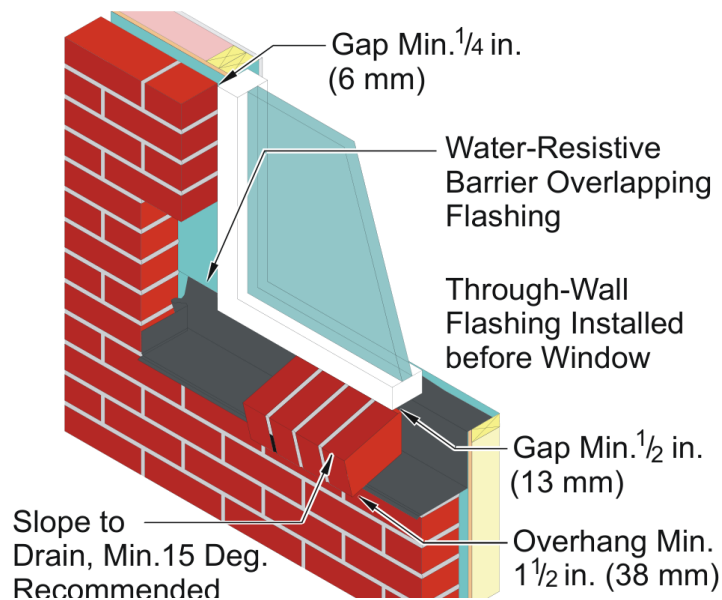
Window jamb and sill detail: through-wall flashing installed before the window, a sill sloped at least 15 degrees to drain, and a minimum half-inch gap between the window frame and the sill below. Why it matters: a sill that doesn't slope, or a gap that's too tight, turns a window sill into a reservoir instead of a drain.
